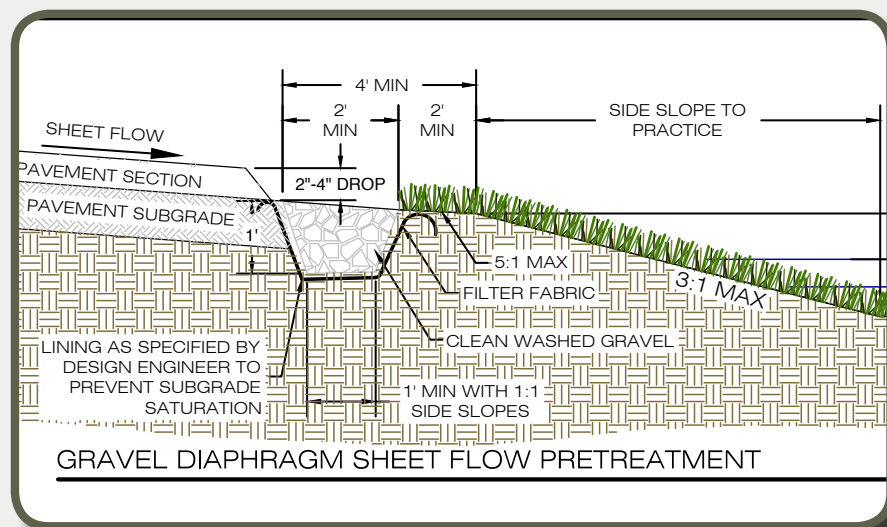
Typical Detail for Pre-Treatment at Pavement Edge – A 2 to 4 inch drop from the pavement to the top of stone helps to prevent clogging.
